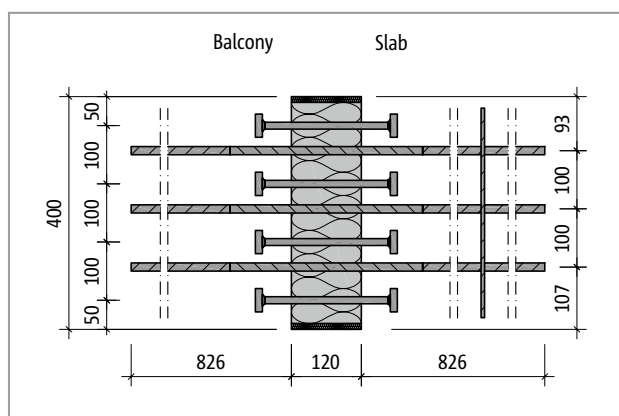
Schöck Isokorb® XT type Q-P-V8: Product layout
